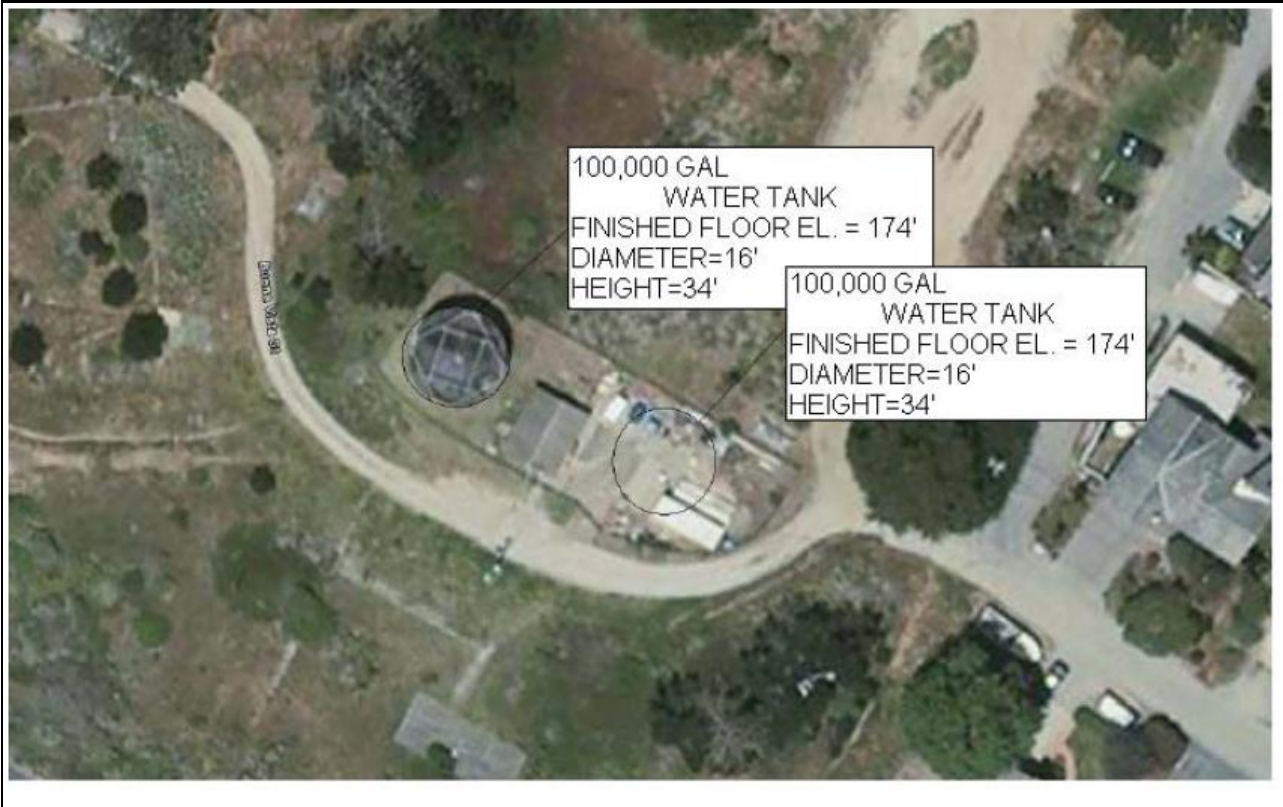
Proposed Schoolhouse Tank Site Plan
